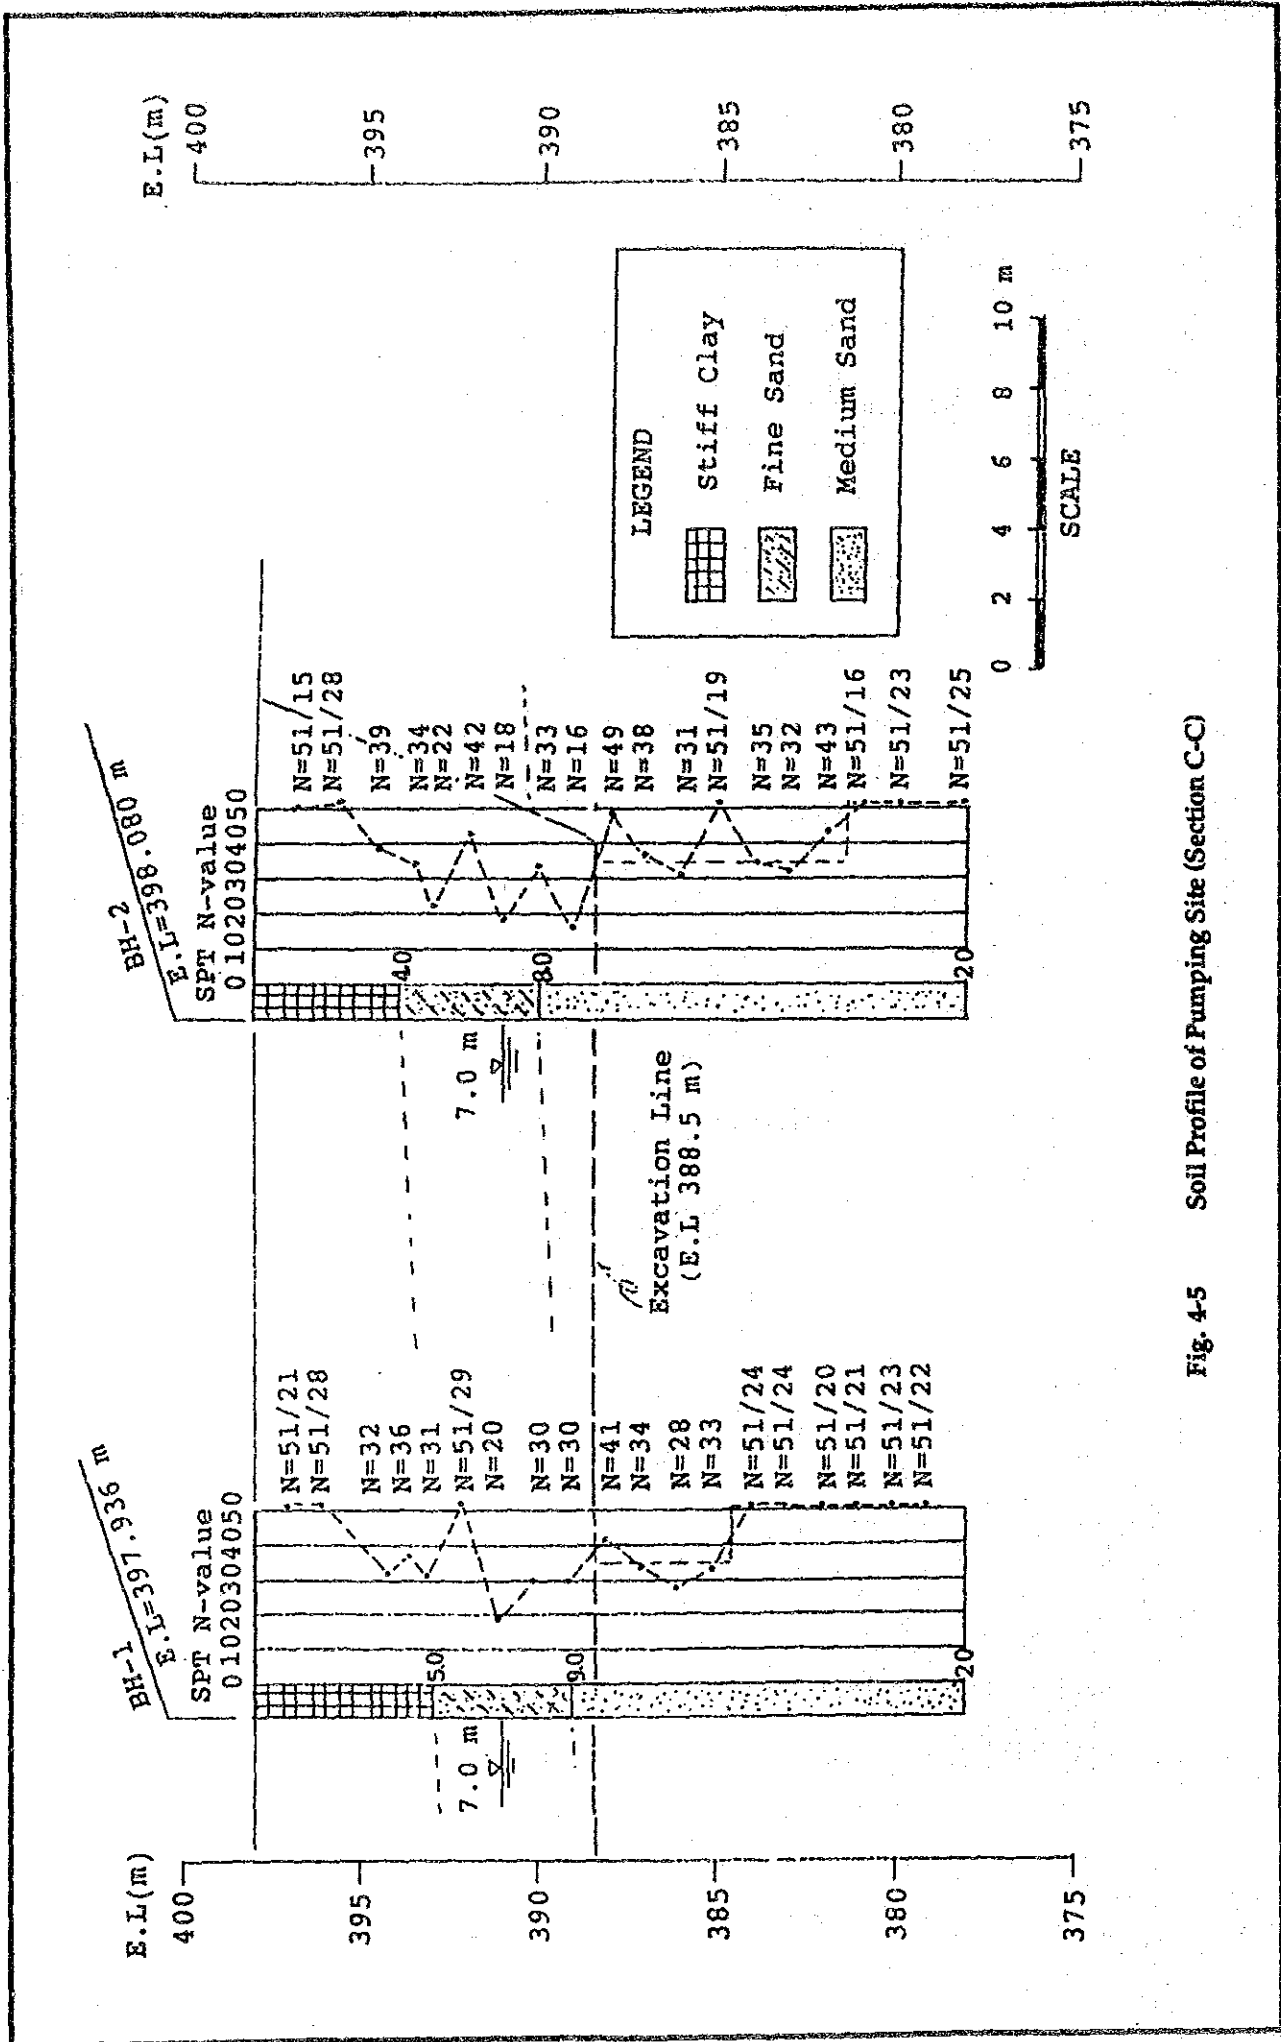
Soil Profile of Pumping Site (Section C-C)
